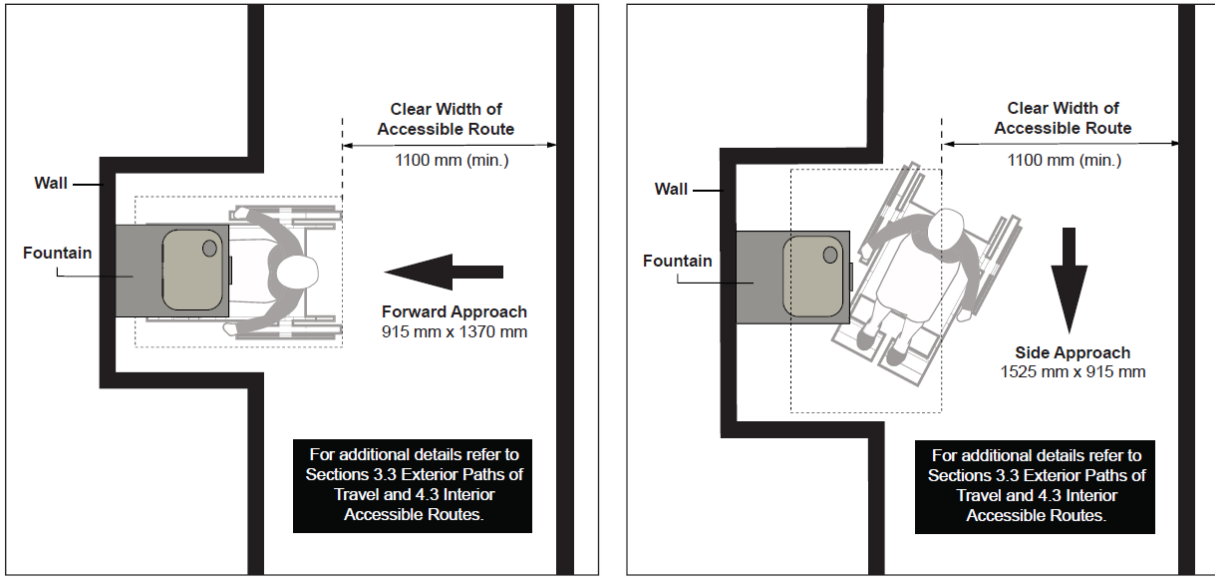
Clear Floor Space Requirements and Approach at Recessed Drinking Fountain – Plan View
